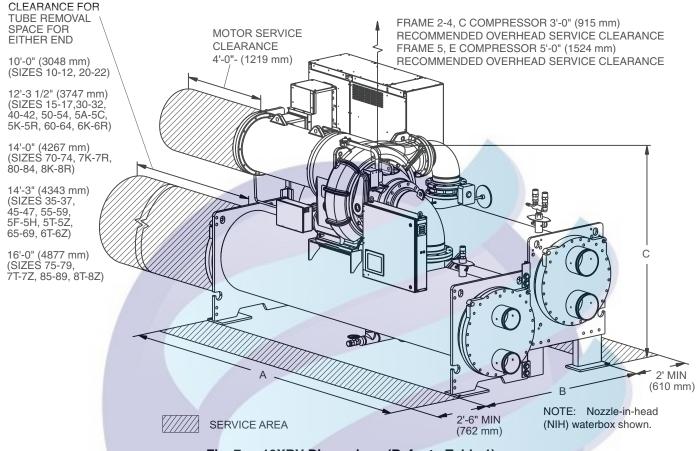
19XRV Dimensions (Refer to Table 1)
